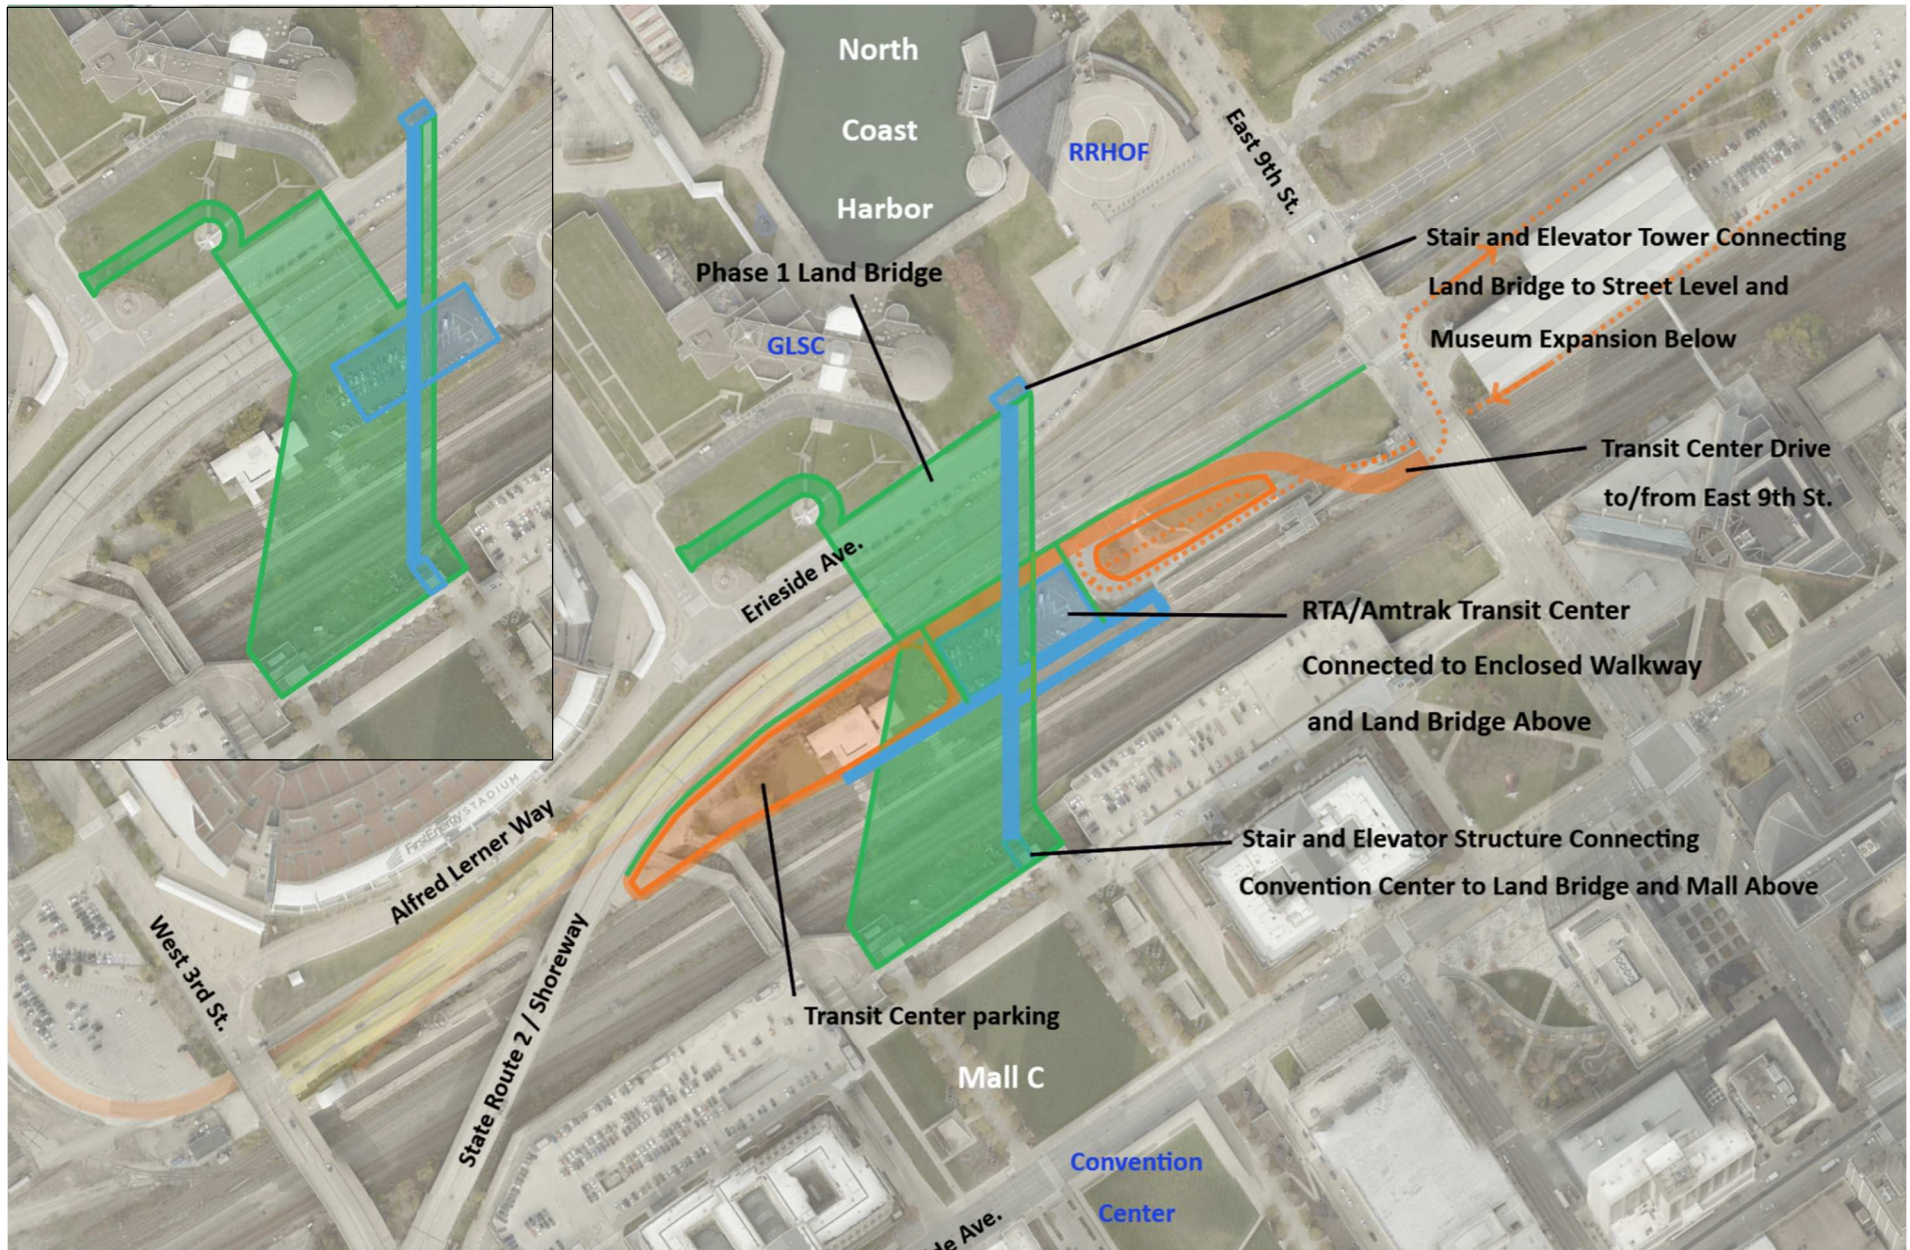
Phase 1 Land Bridge with Enclosed Walkway above Transit Center (Shoreway No-Build / Concept A)
